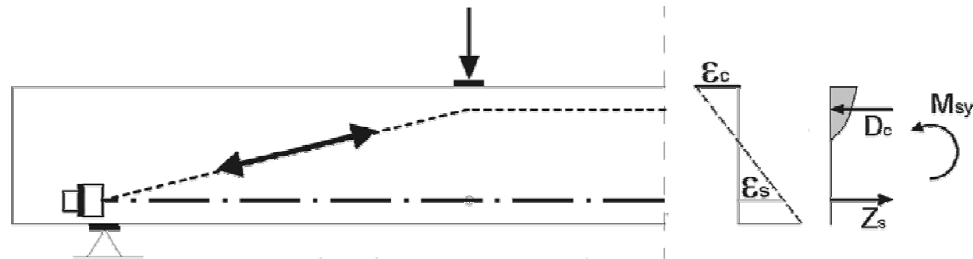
Lattice model with no bond between reinforcement and concrete
